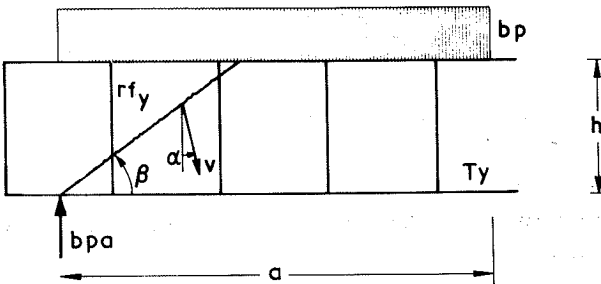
Failure mechanism of beam with vertical stirrups subjected to distributed loading
